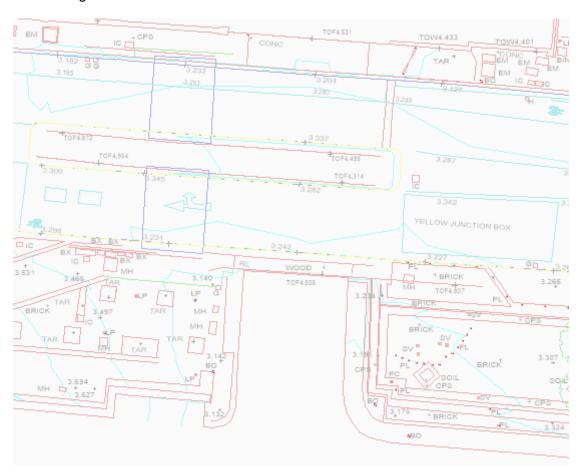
Detail of the topography information in the area of Spencer Dock Draw bridge and Royal Canal Footbridge
